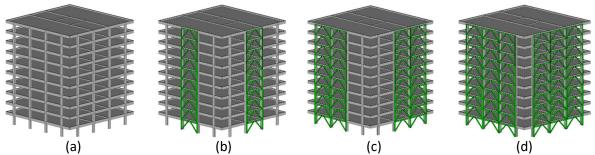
Building models (a) Unretrofitted case, and retrofitted buildings with EBF system for (b) 34%, (c) 68%, and (d) 100% NBS.
